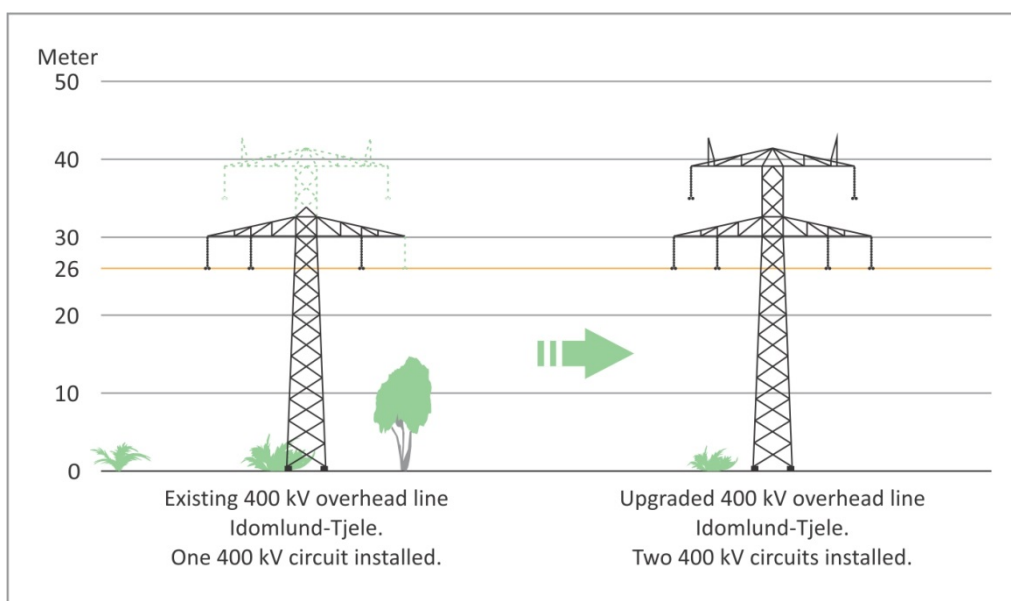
Proposed refitting of existing 400 kV Donau towers.
